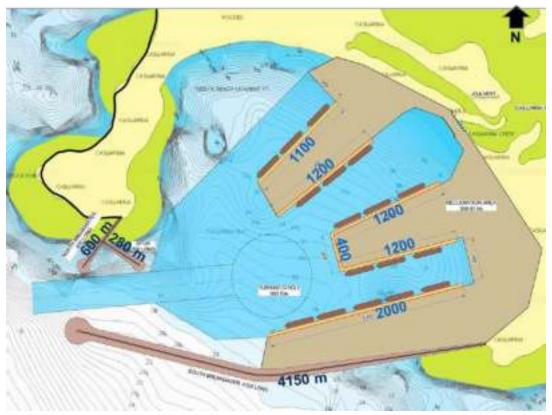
Casuarina Bay Location – Proposed Layout (Site 2)
